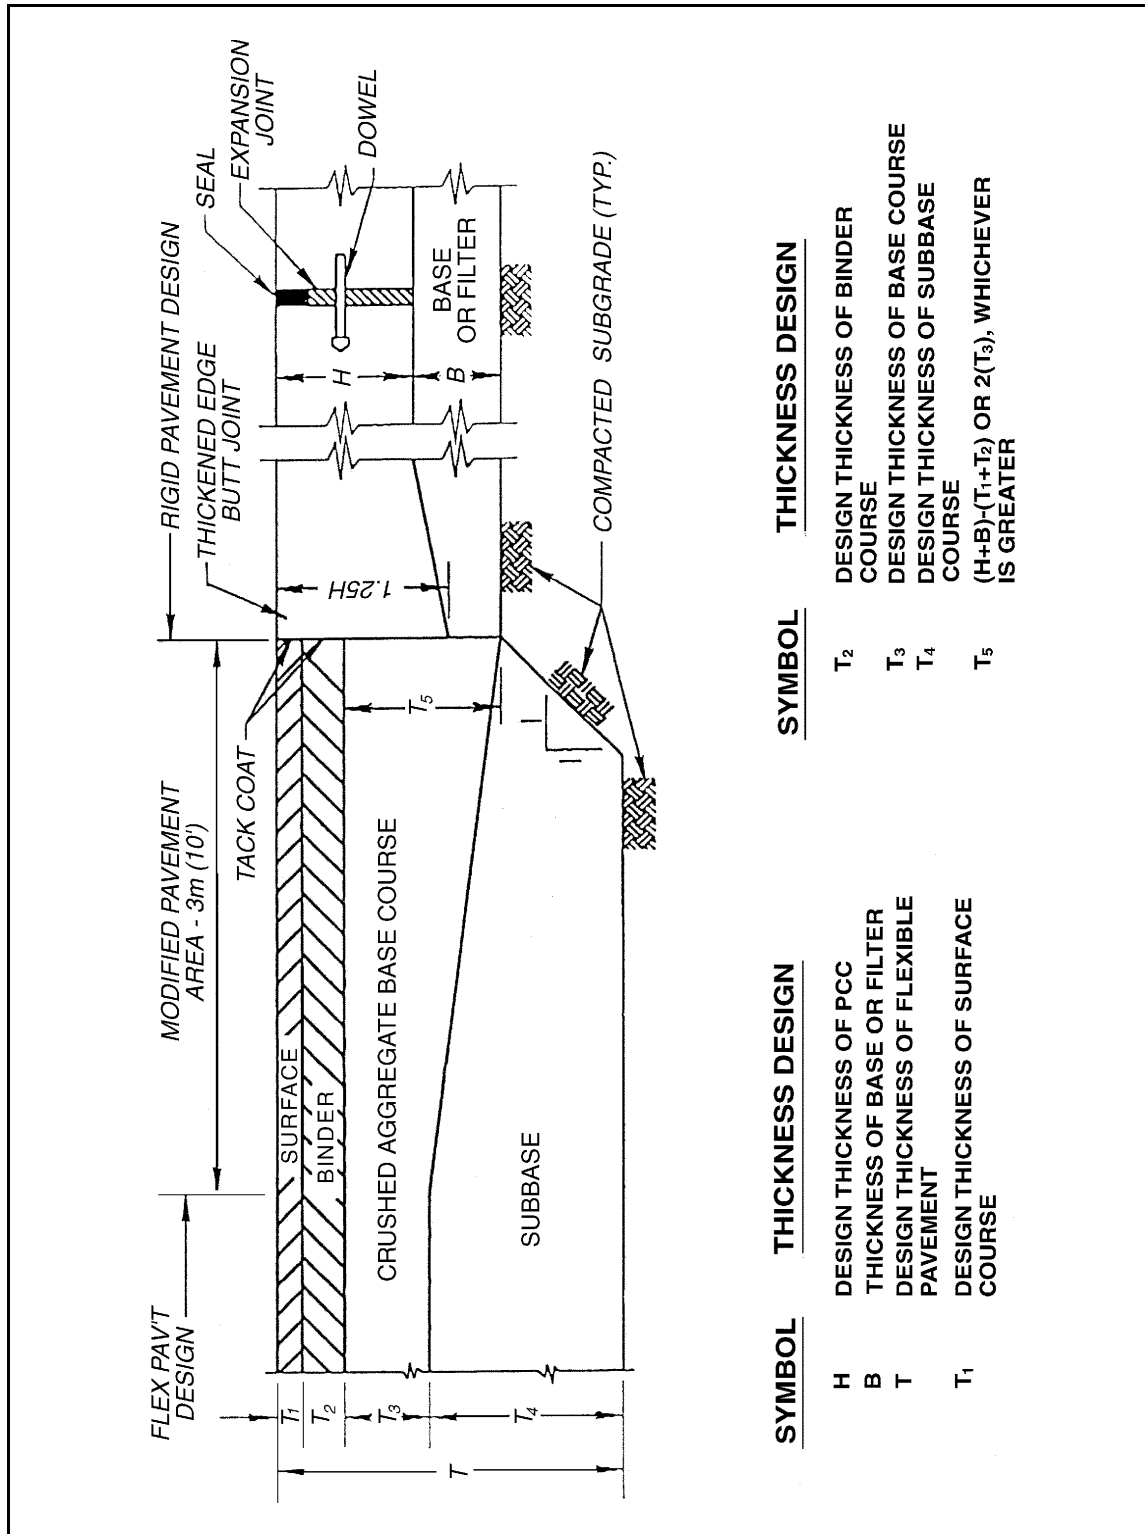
Rigid-flexible pavement junction (Army or Air Force)
